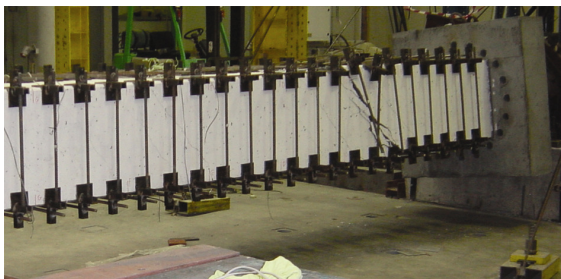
Failure of the strengthened beam: Beam E-0.75-5.4-0.76
